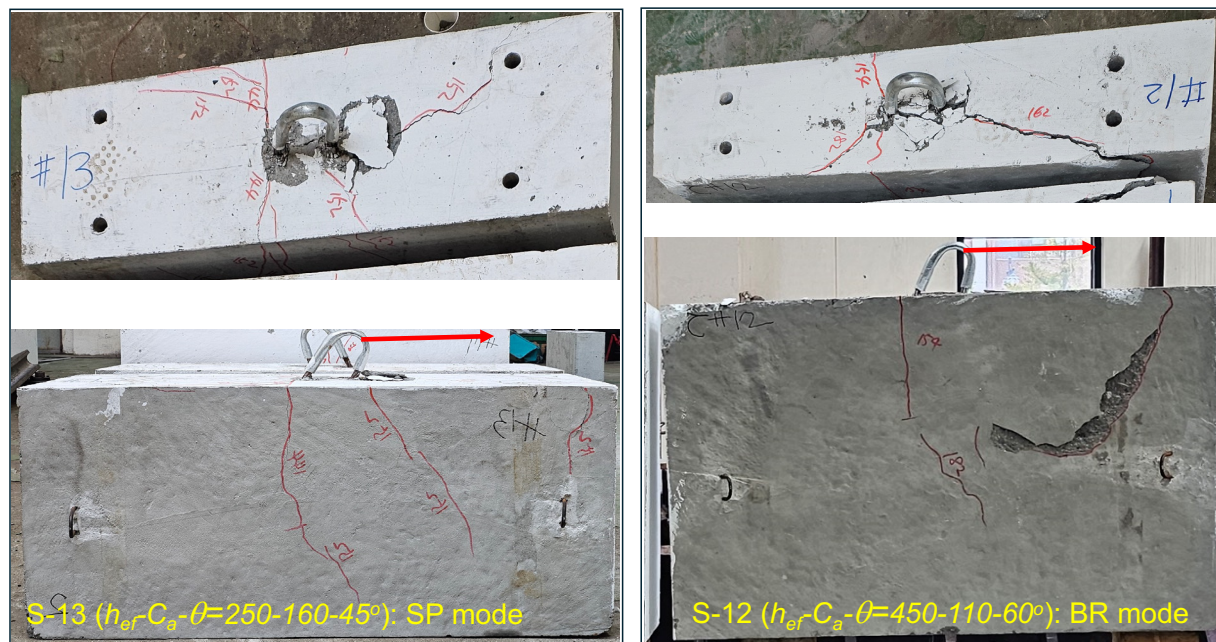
Example of failure modes: splitting rupture and breakout failure of concrete. Note: BR = breakout failure of the concrete; S-12 = specimen 12; S-13 = specimen 13; SP = splitting rupture of the concrete.
